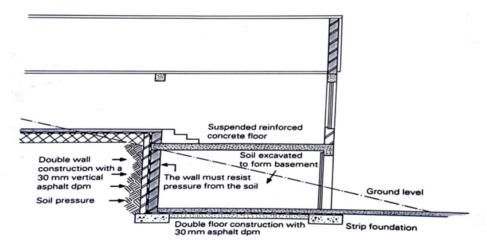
Excavate a sloping side of land to create a basement floor
